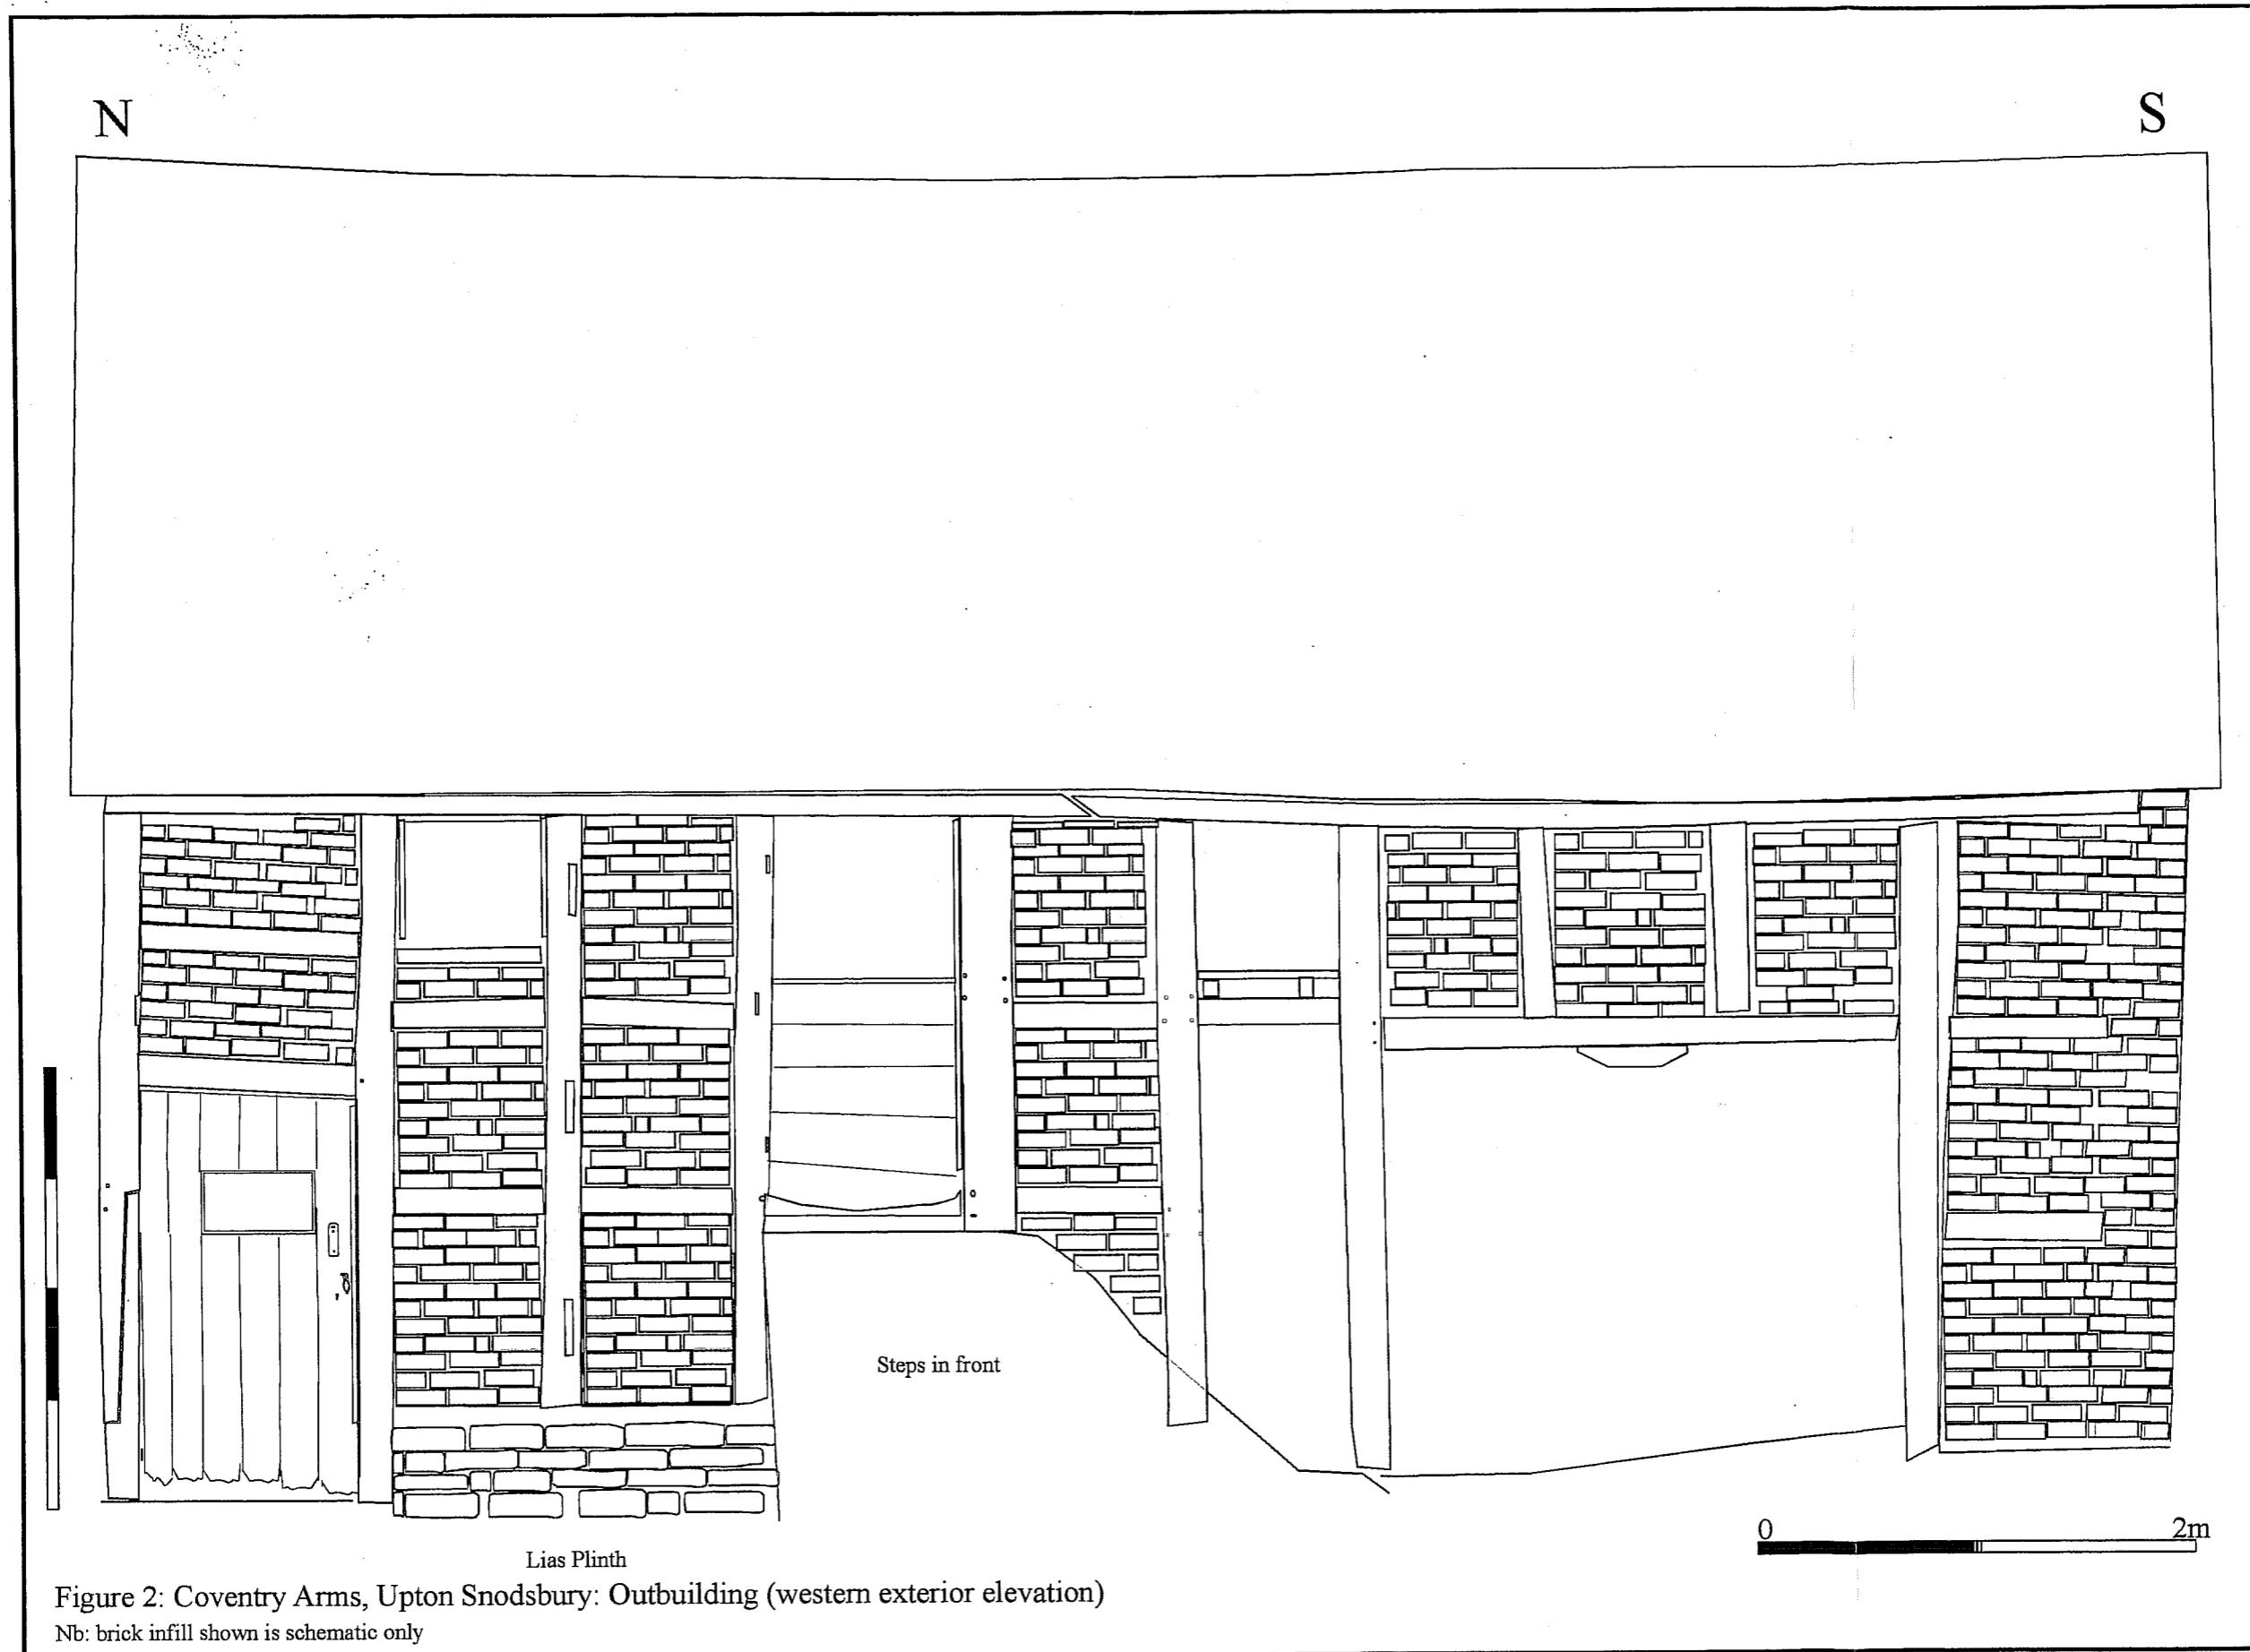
Coventry Arms, Upton Snodsbury: Outbuilding (western exterior elevation)
